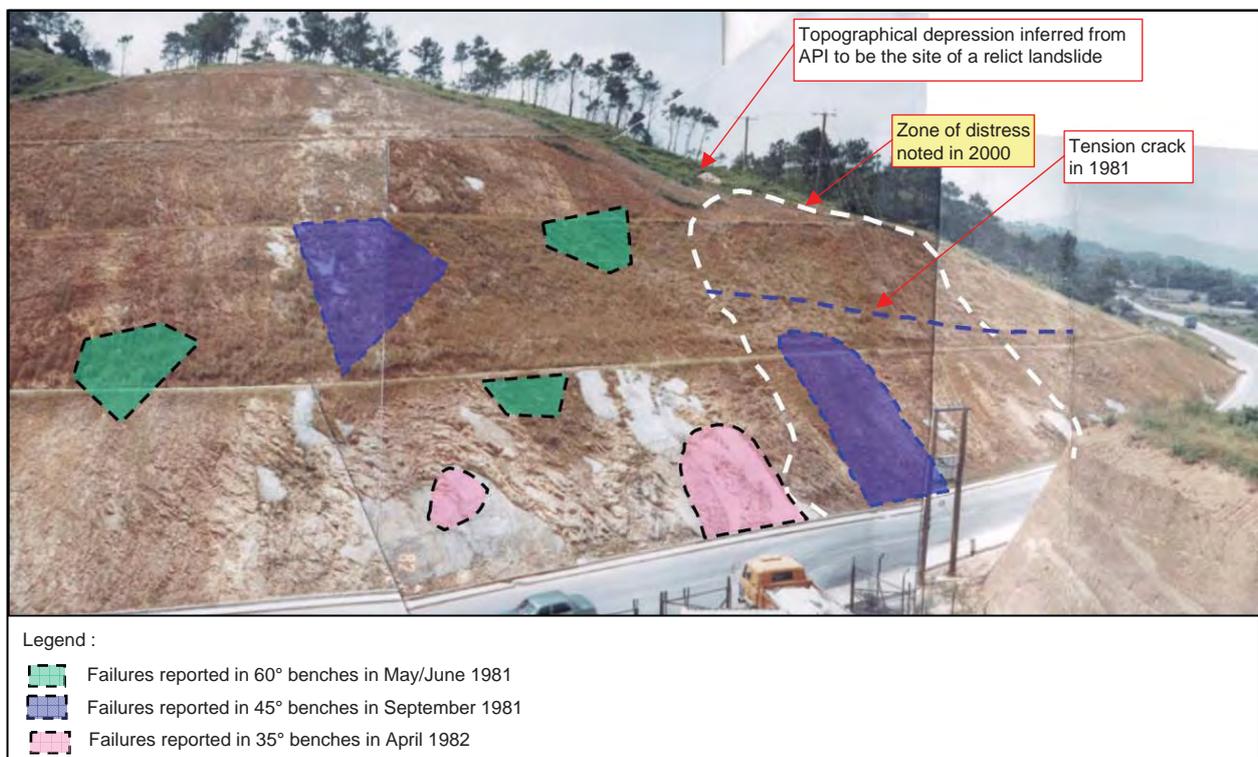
1982 photograph showing history of cut slope instability at Lin Ma Hang Road
